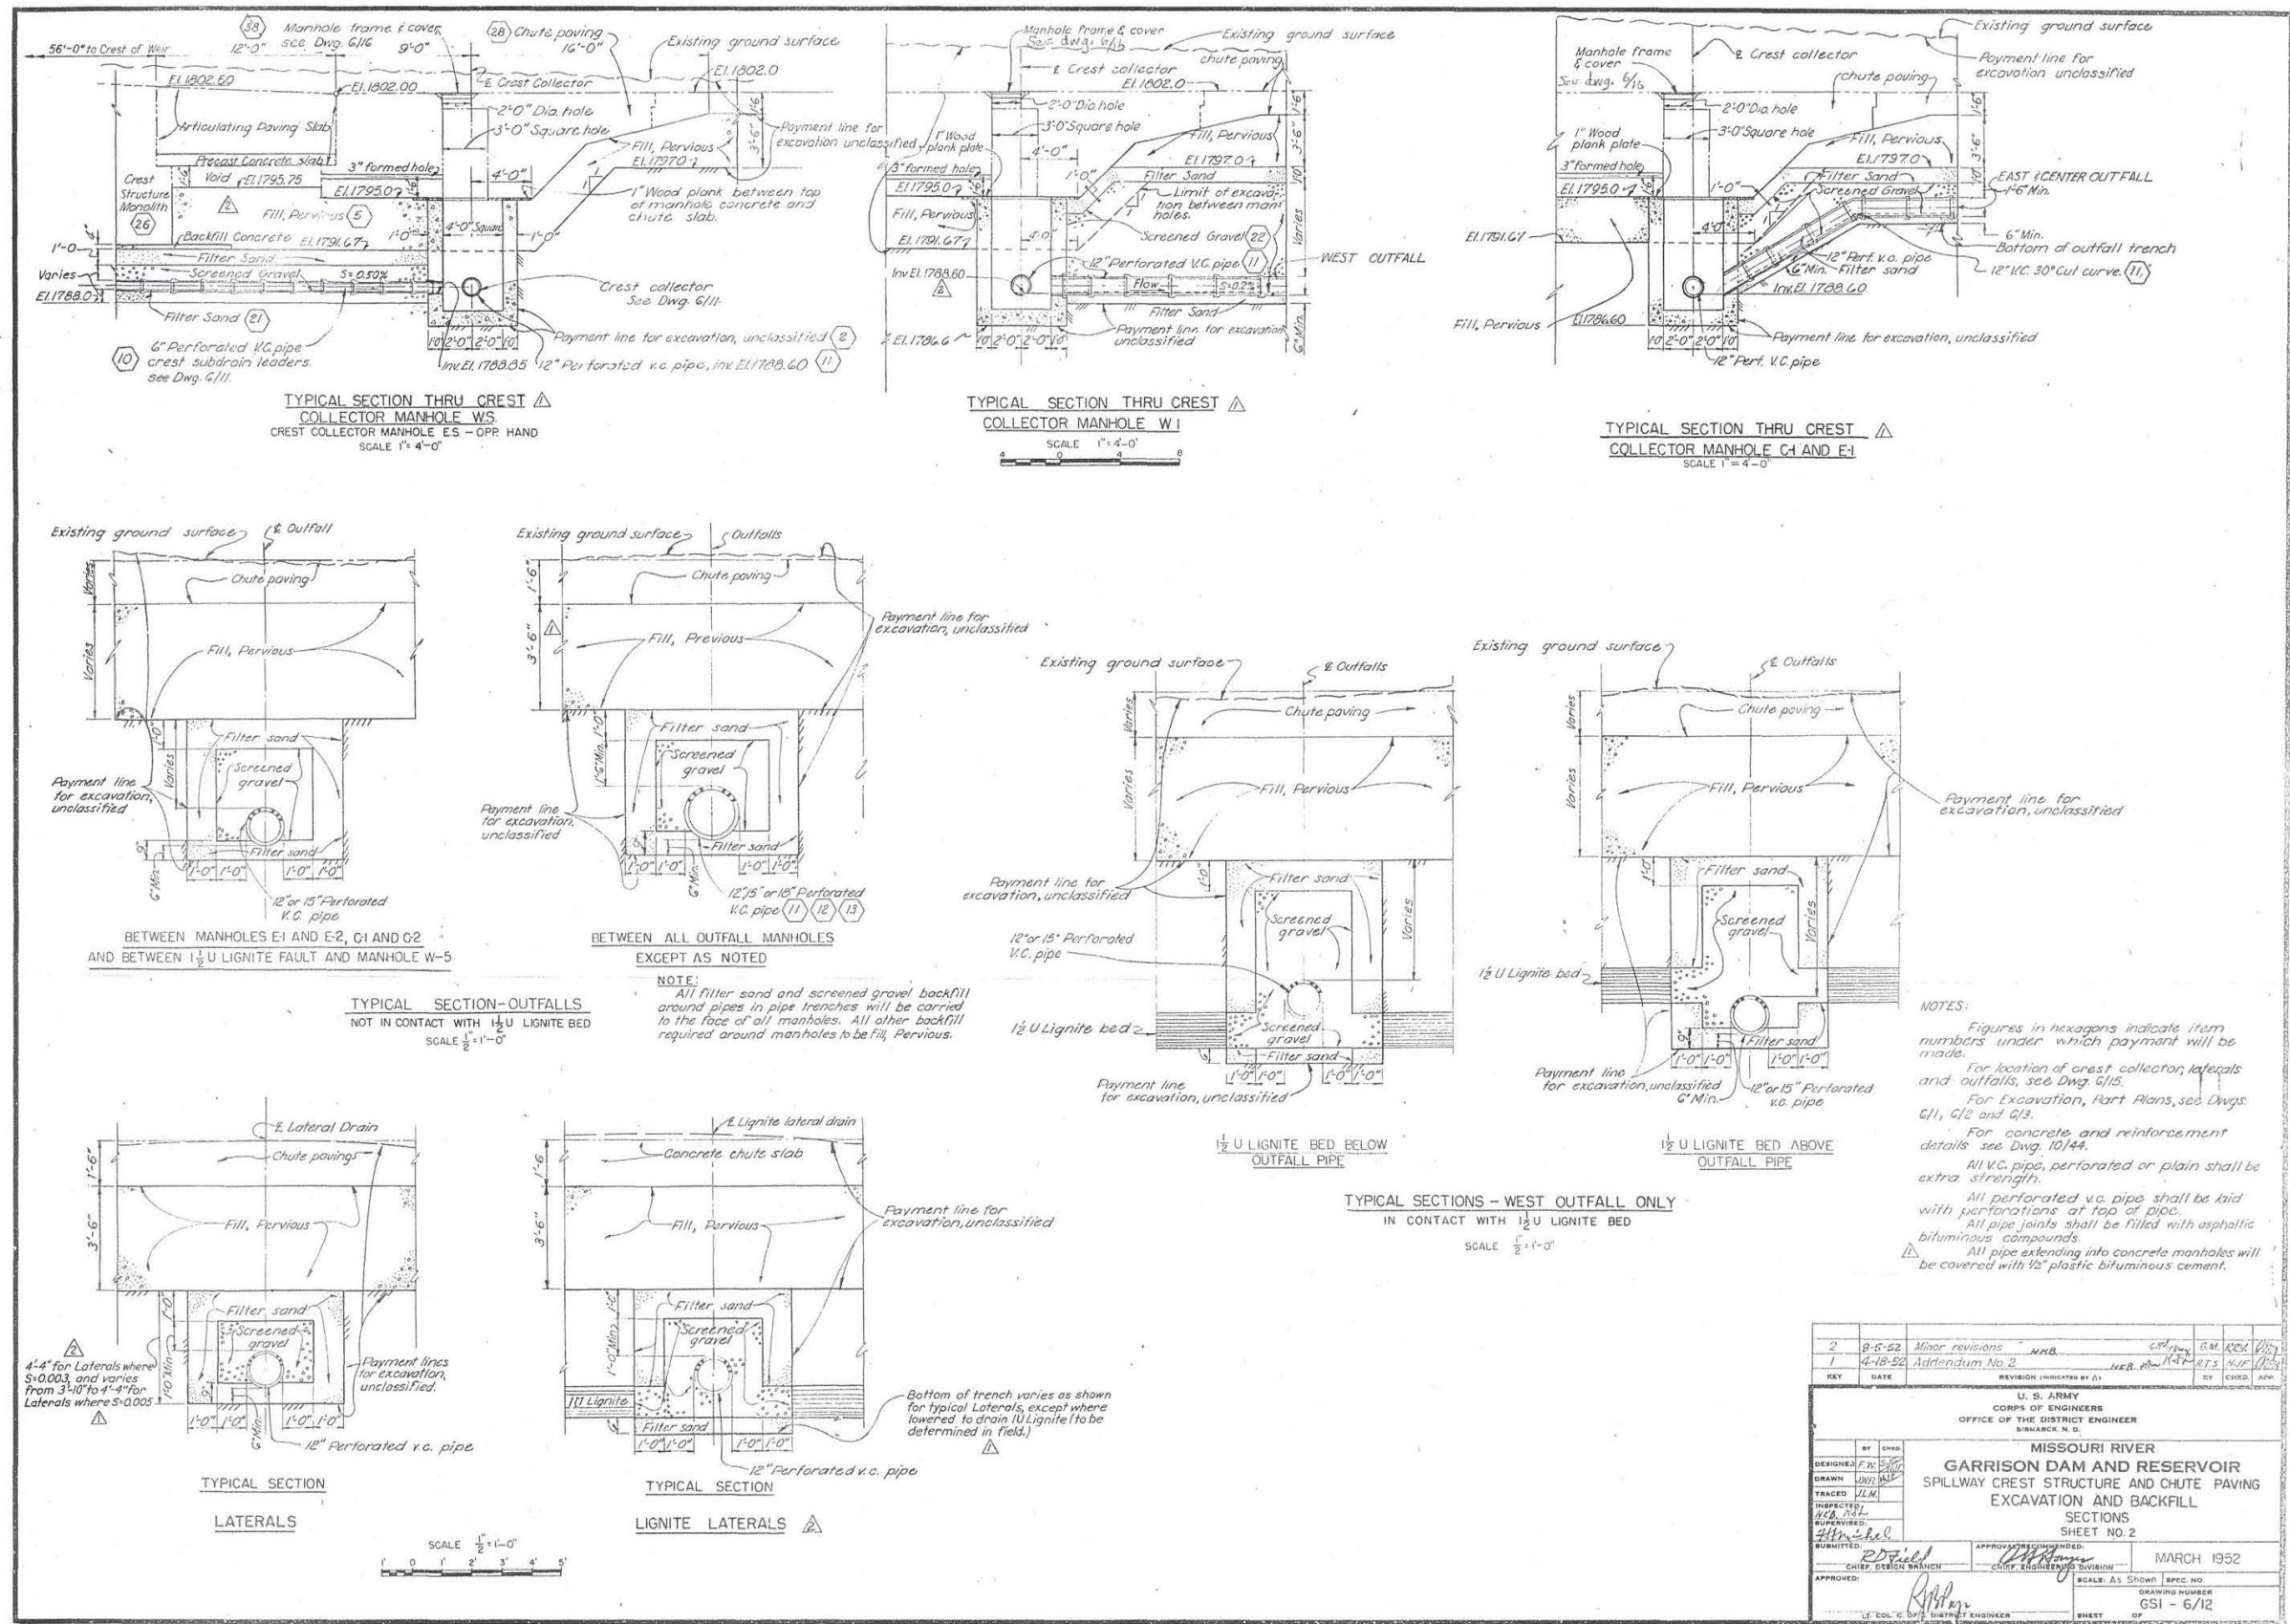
Row I manholes and typical lateral drains original drawing (GSI, upper chute)
